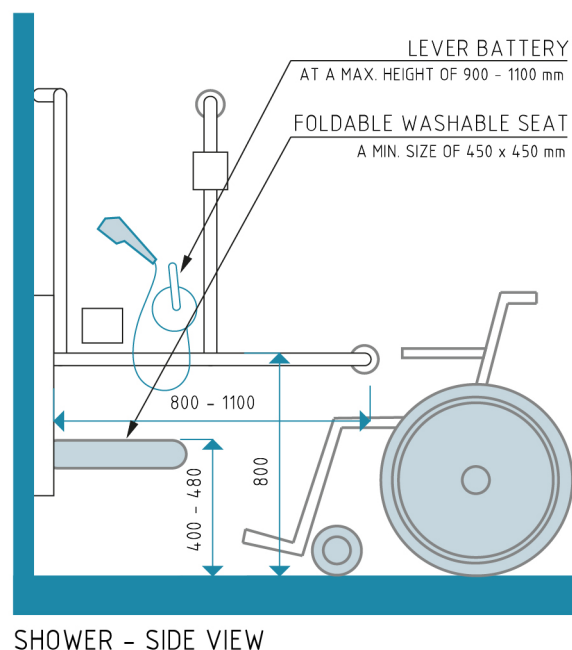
View of shower with appropriate dimensions (Rollová, Filová, Suláková)
